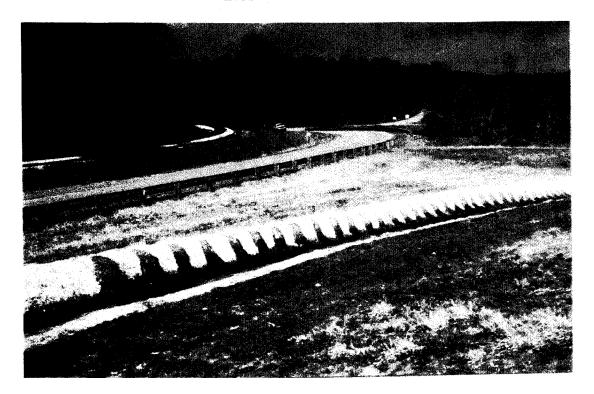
Looking northeast: Drainage ditch along Swan Pond Road
